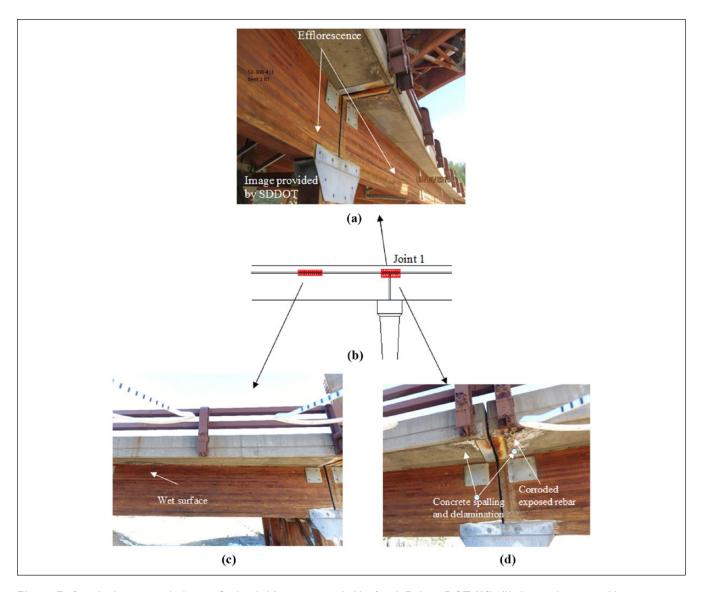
Sample damage on deck near Girder 4: (a) image provided by South Dakota DOT (13), (b) damage locations, (c) water leakage under deck between South Abutment and Joint I, and (d) concrete spalling and corrosion with exposed rebar near Girder 4 at Joint I.
